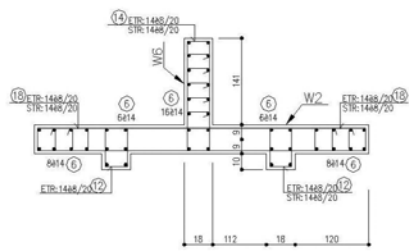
The Structural Plan of a Typical Floor Reinforcement Detailing for a Wall Section Extracted from the Plan Given in Figure 12
